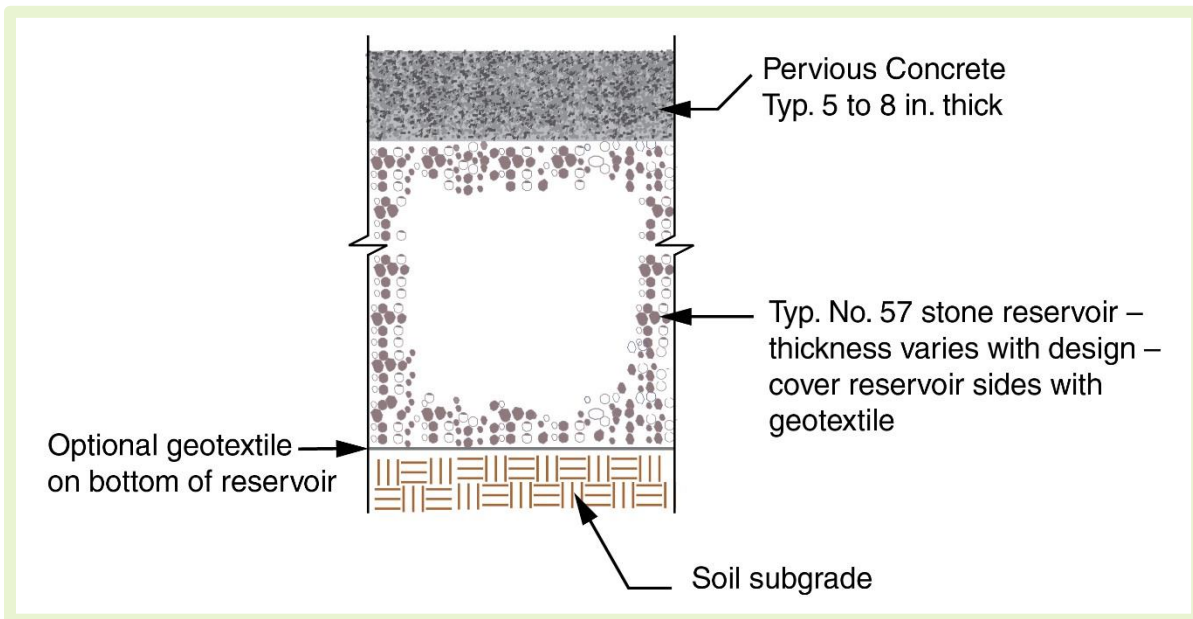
Typical Pervious Concrete Pavement (Credit: ICPI)
